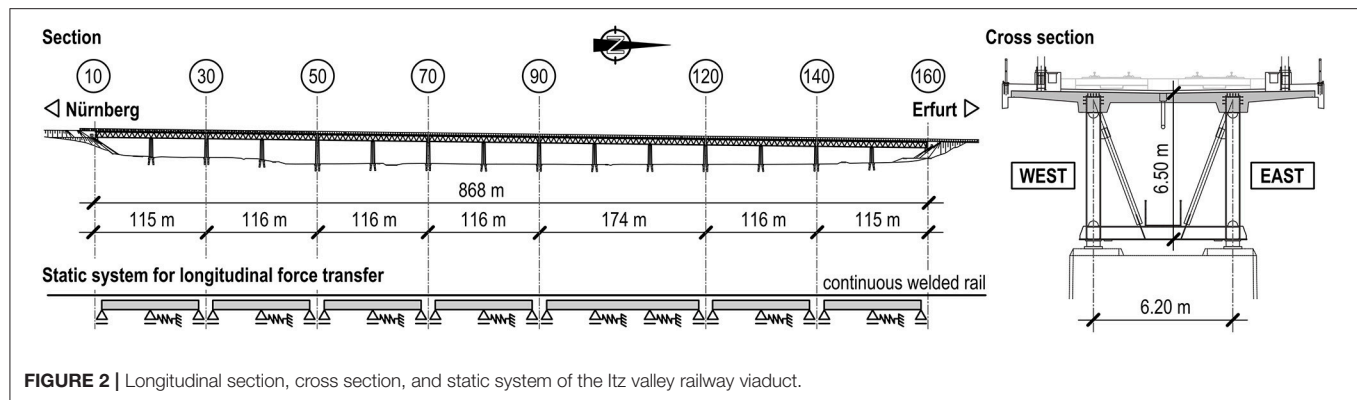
| Longitudinal section, cross section, and static system of the Itz valley railway viaduct.
